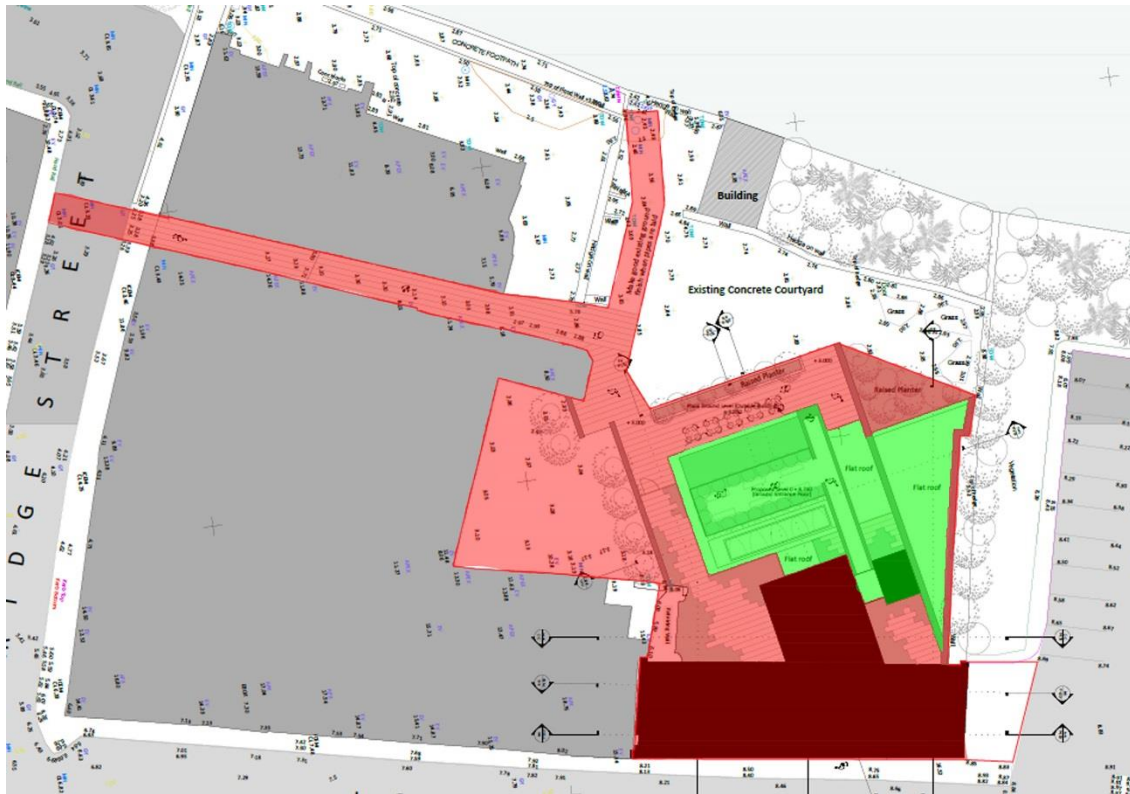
Extract from ODKM drawings showing the location of new concrete foundation slab for the new extension buildings to the rear of the existing Grain Store within the courtyard level, with excavation for same to a depth of c.900mm (highlighted in green); with the proposed excavation of the existing concrete courtyard ground surface to a depth of c.500mm highlighted in red.
